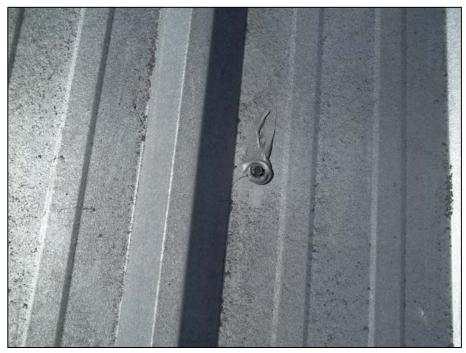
TYPICAL ROOF SCREW THAT HAS BEEN RE-SEALED
